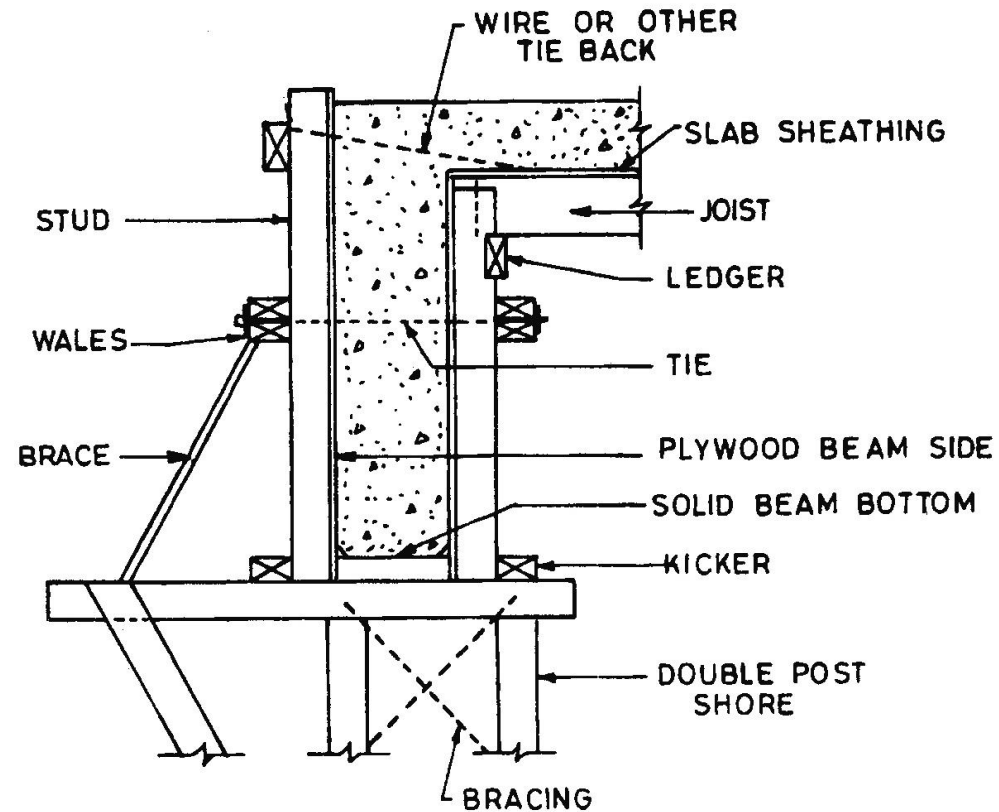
TYPICAL STUD AND WALE FORMING FOR A SPANDREL BEAM WITH BRACING
